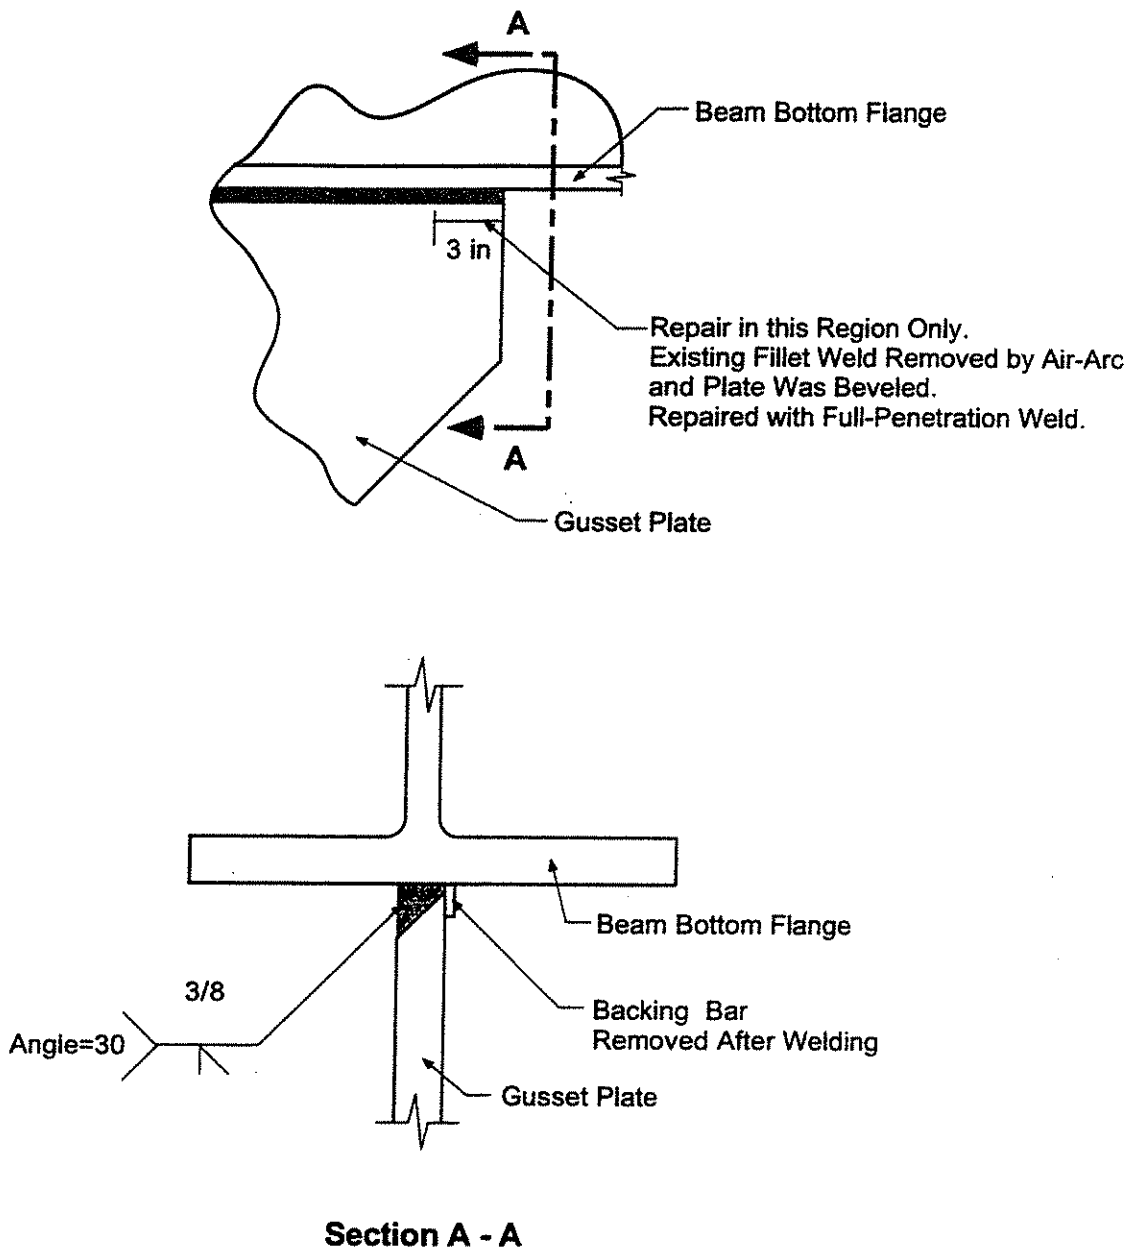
Repair detail for weld connection between gusset plate and beam bottom flange.
